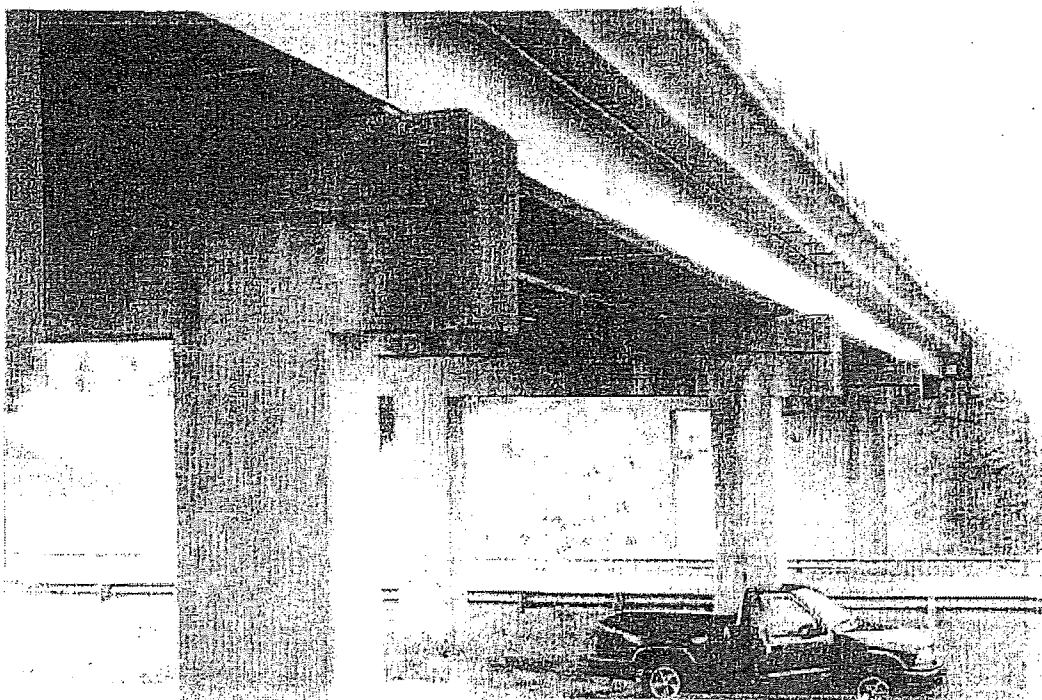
I-59 (SBR) Bridge Over SR68 at Collinsville
